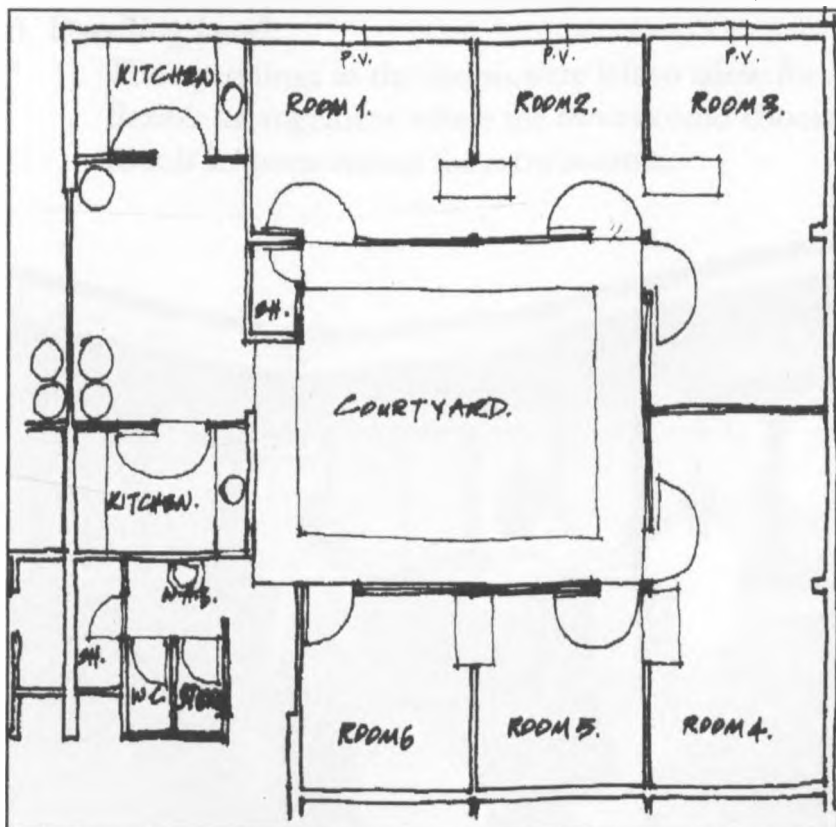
Typical Floor Plan for the Fort Jesus Houses.
